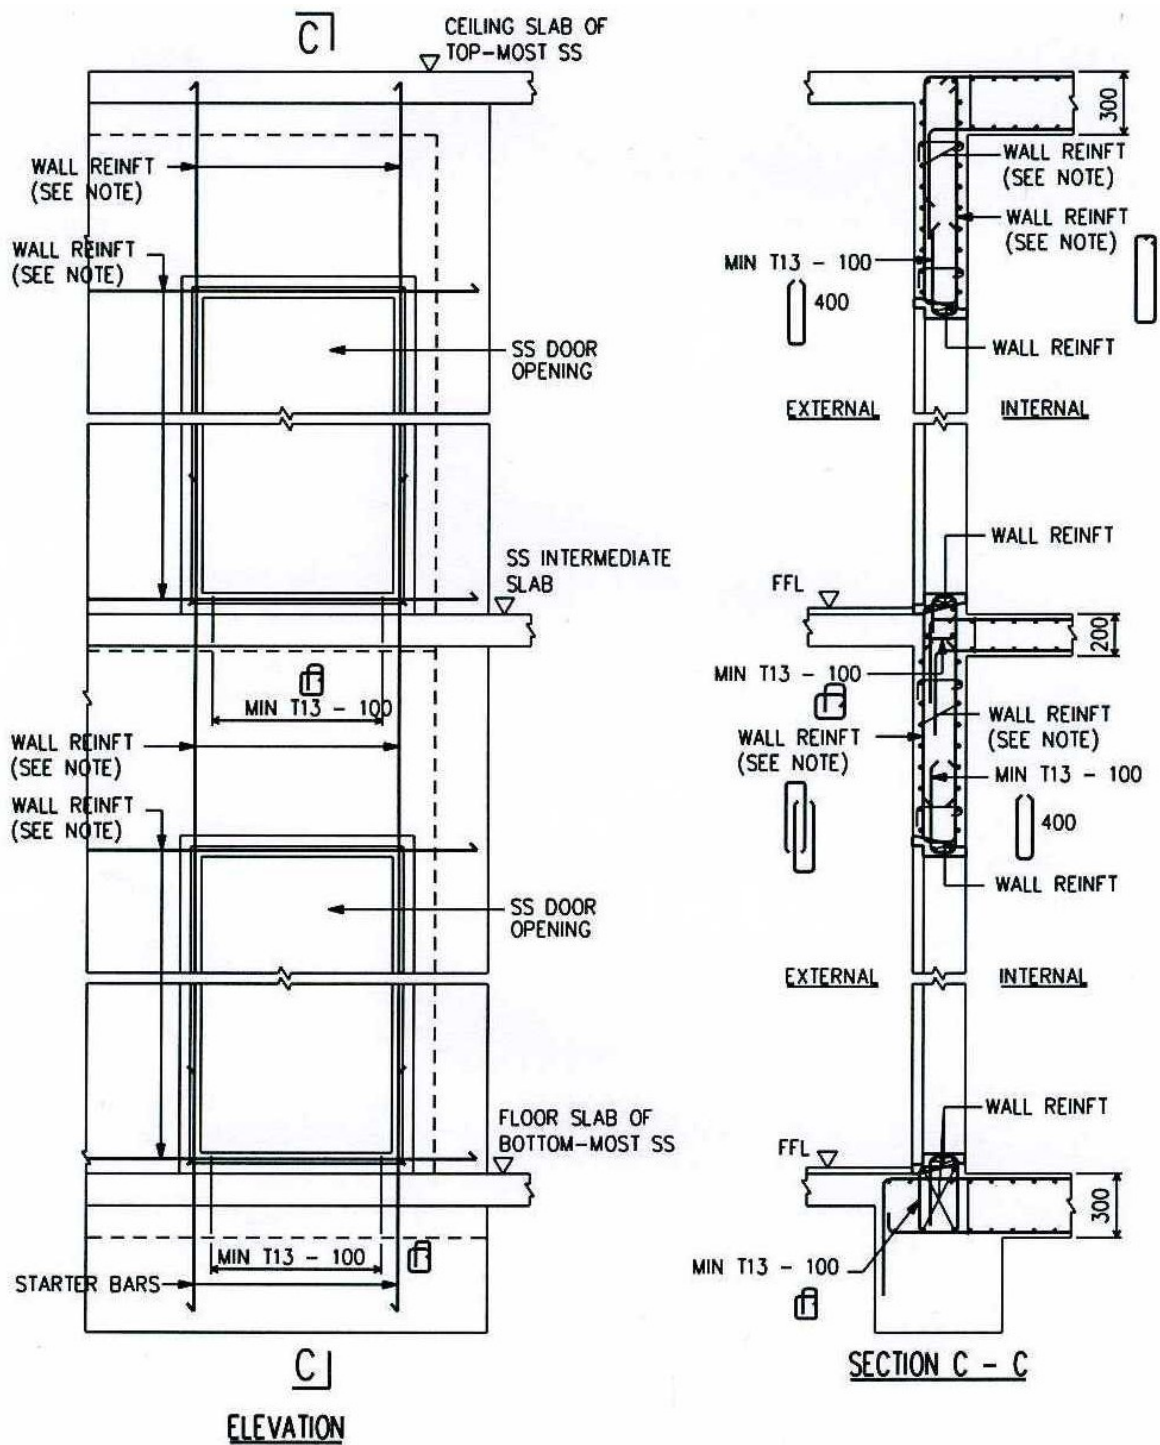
(e) DETAILS OF SS WALL REINFORCEMENT NEAR SS DOOR
